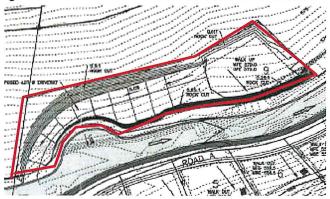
Proposed R1 Portion of Split Zoned Lot
